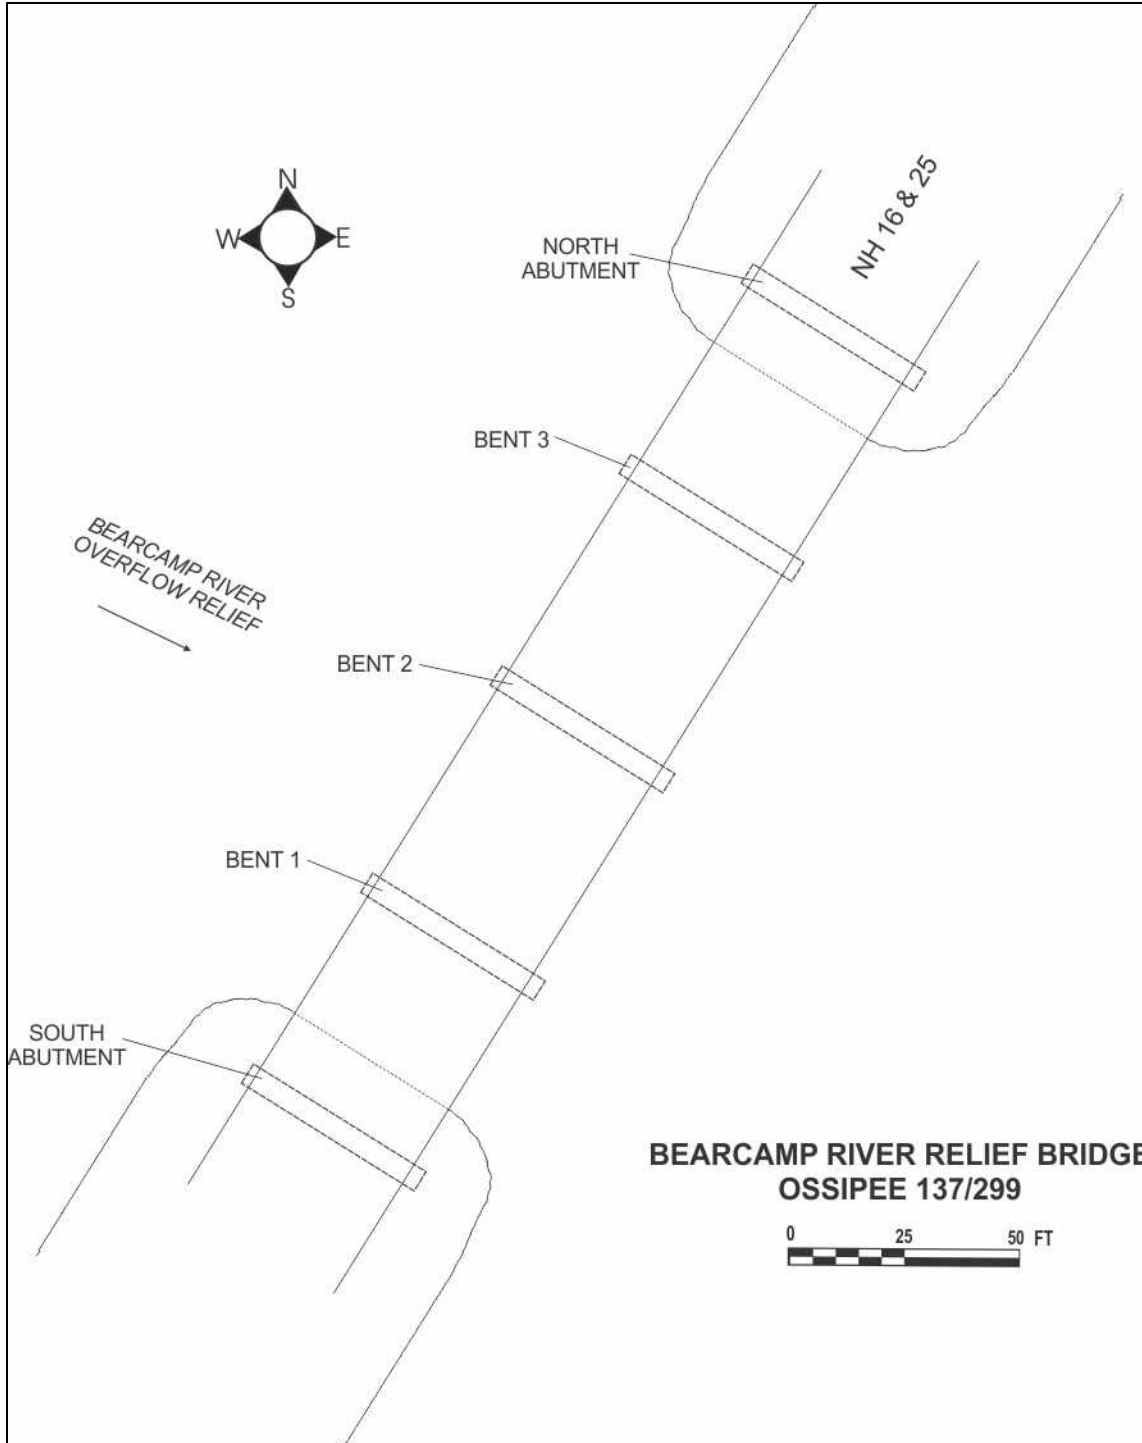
Bearcamp River Relief Bridge, Site Sketch
